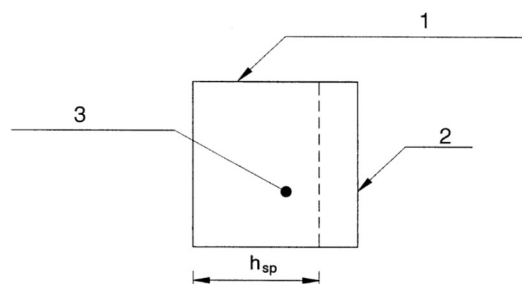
Notch specification: 1) Top surface during casting; 2) Notch; 3) Cross-section of the tested specimen
